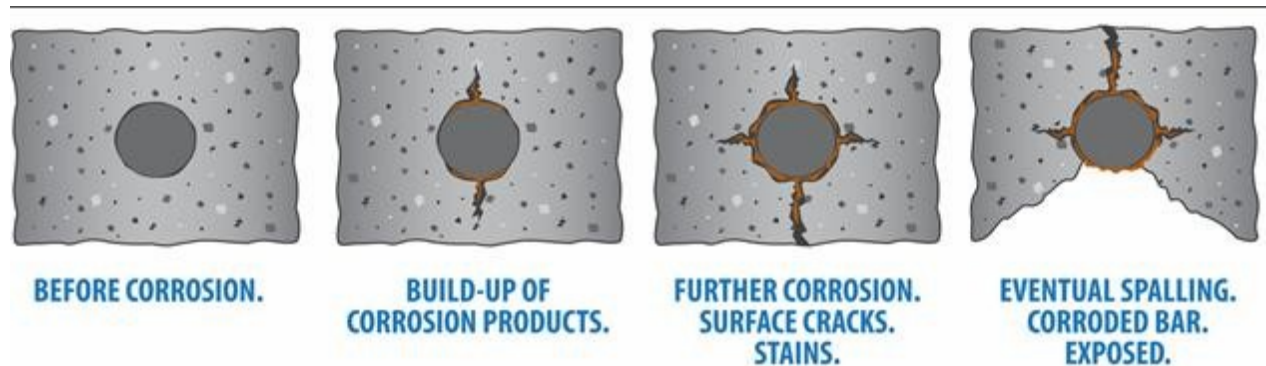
Buildup of corrosion products, spalling of concrete cover and exposure of reinforcements
